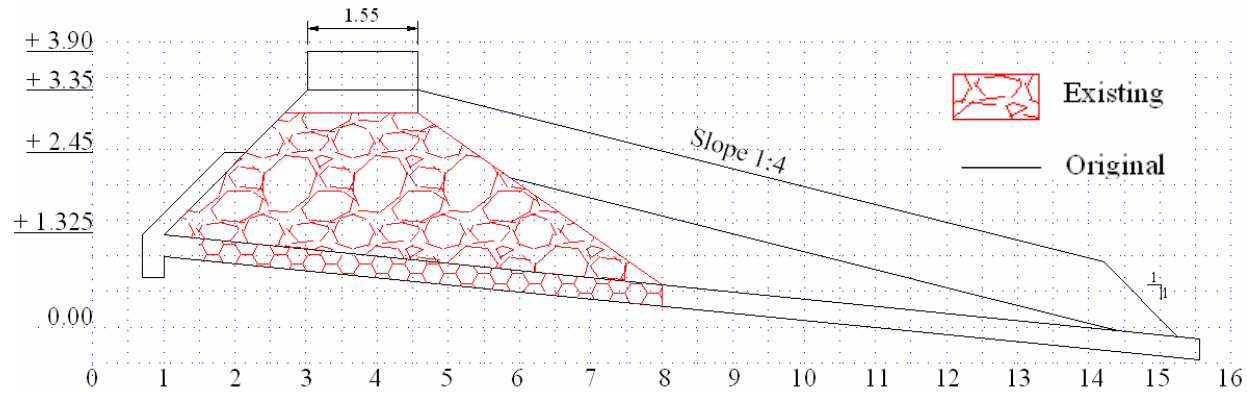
Cross-section of existing seawall at Edavanakadu
